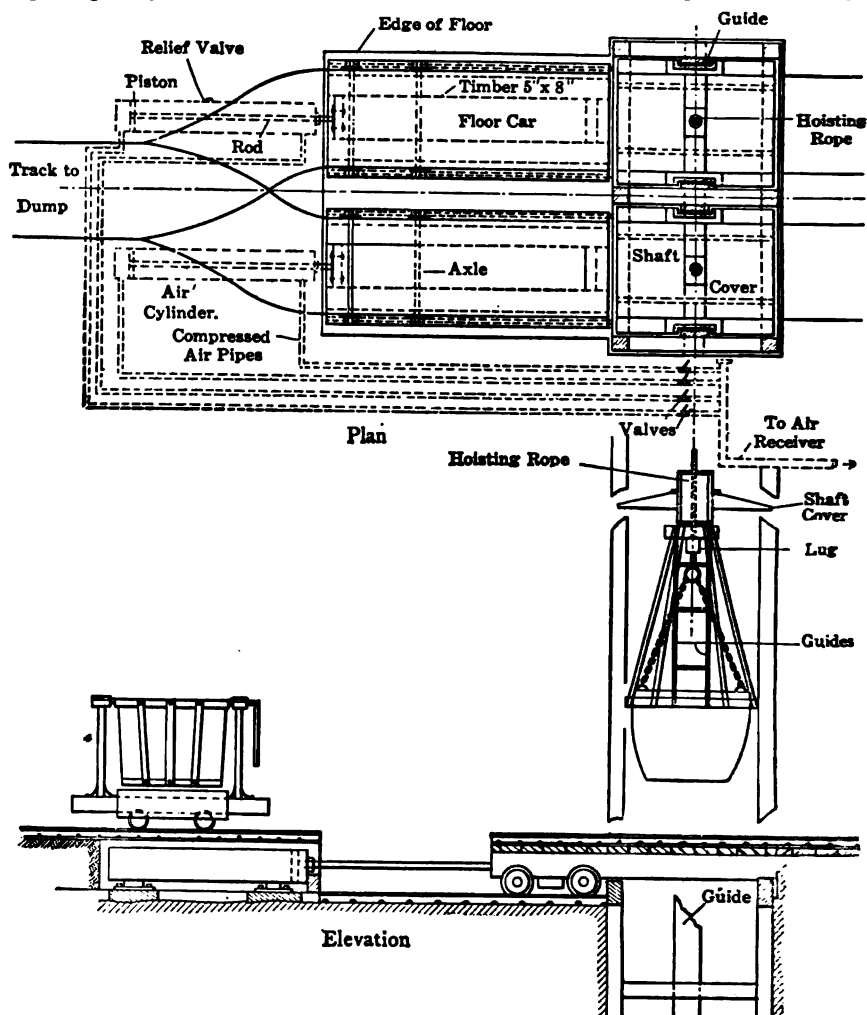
SURFACE ARRANGEMENT FOR HANDLING SINKING BUCKETS BY COMPRESSED AIR.
